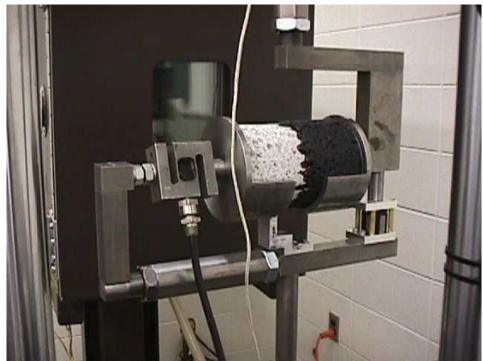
Loading Simulated Bridge Deck Control Specimen into the Fixture.
